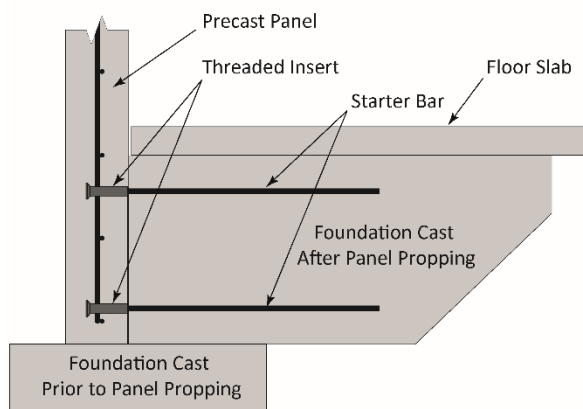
Schematic representation of a dowel type precast panel to foundation connection utilizing threaded inserts.
